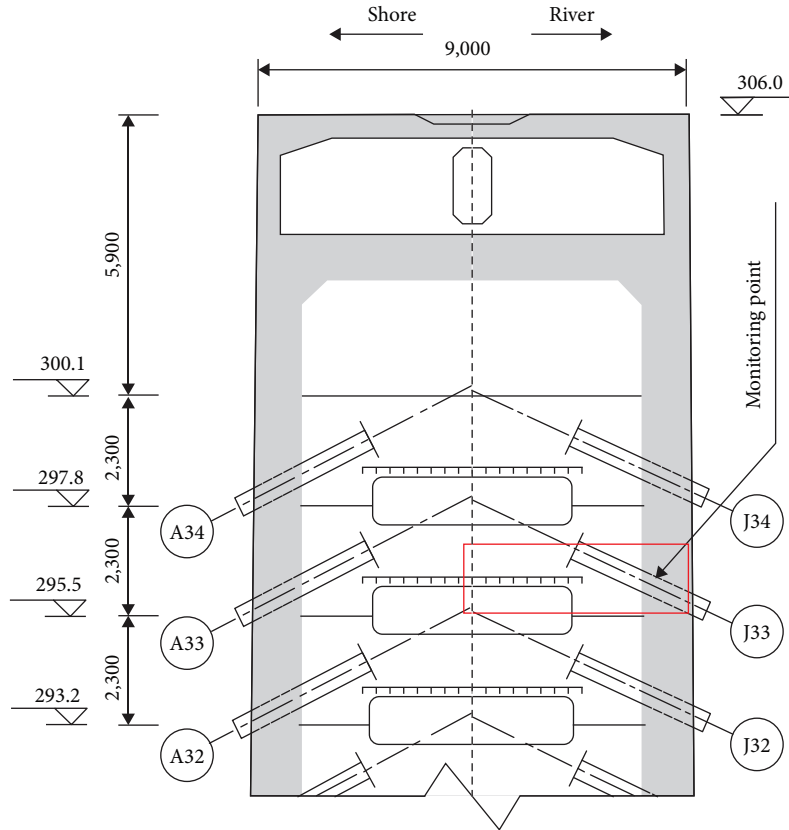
Anchorage zone at the top of the cable-pylon (elevation unit: m, length unit: mm).
